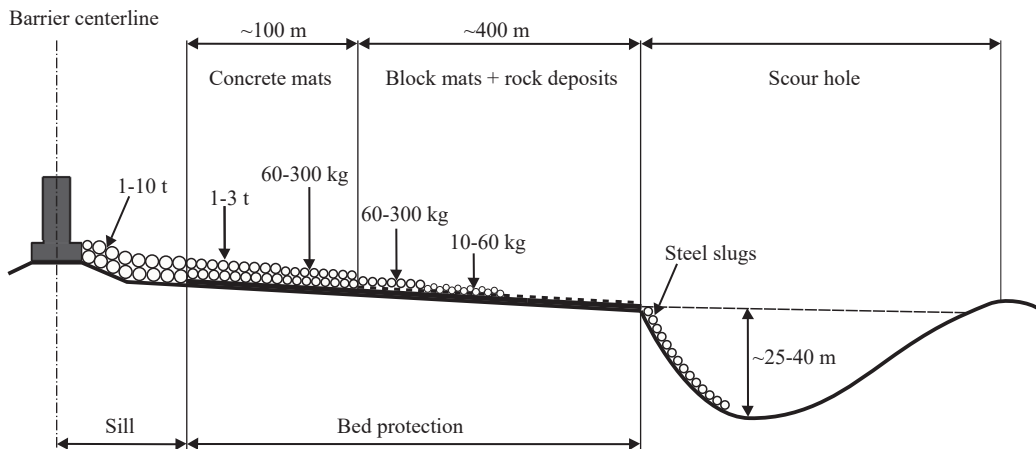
Cross section of the bed protection applied at Eastern Scheldt storm surge barrier. From the barrier axis, this bed protection consists of the barrier sill and a transitional section with large concrete blocks weighing between 1 and 10 metric tonnes. Next, concrete mats with weights ranging between 60 kg until 3 metric tonnes are applied; the larger weights are located closest to the barrier. Then, the protection consists of block mats with rock-deposits on top, with the weight of the rock material ranging from 10-600 kg. Downstream of the bed protection, large scour holes have formed. To stabilize the slopes of the scour holes, steel slug deposits were applied.
